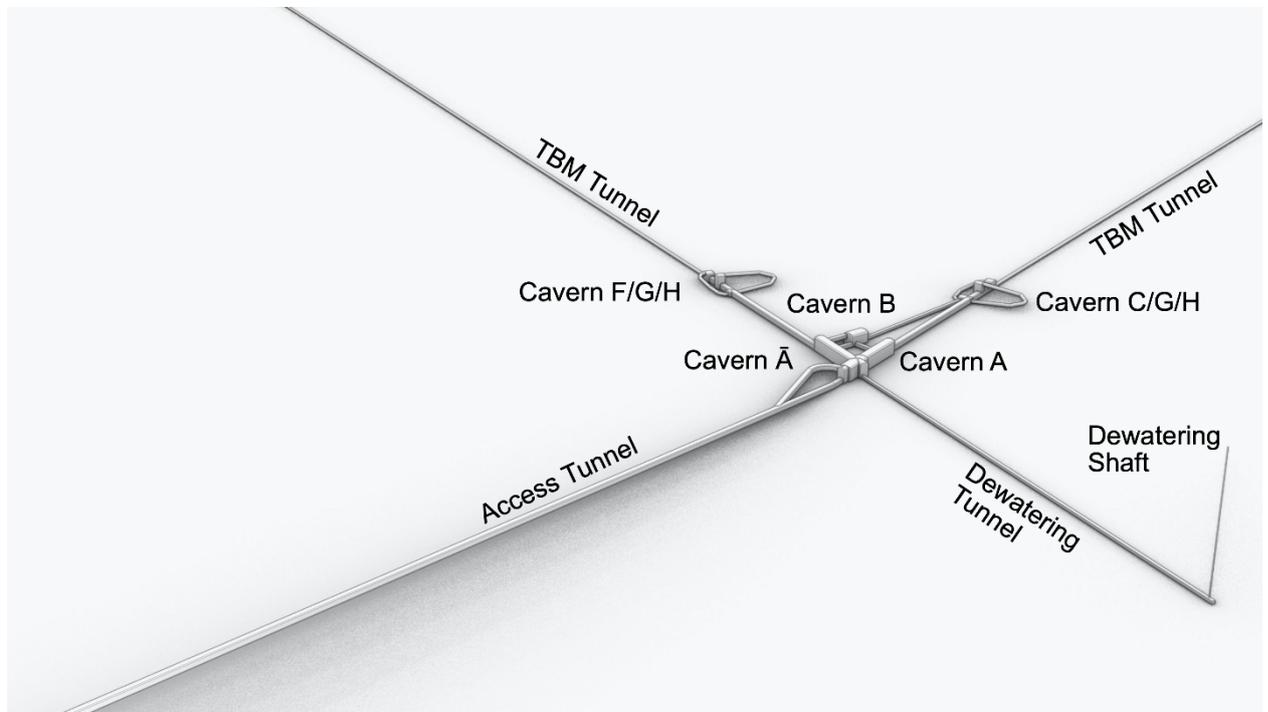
Perspective view of the underground structure at the intersection point with an inclined access tunnel
